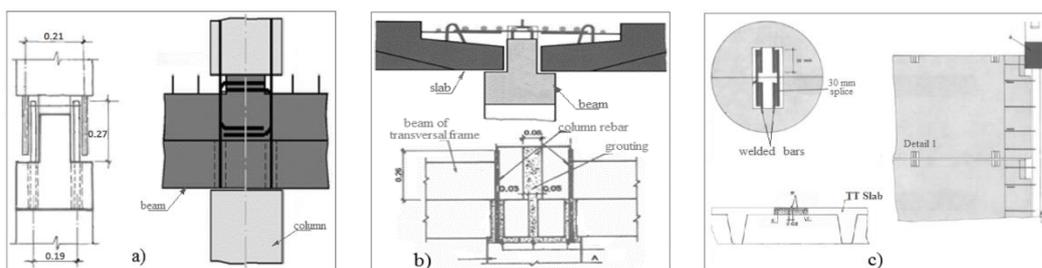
Details of the typical joints of the system: a) beam-column joint, b) the TT slab-beam joint, and c) longitudinal joint between TT slabs.
